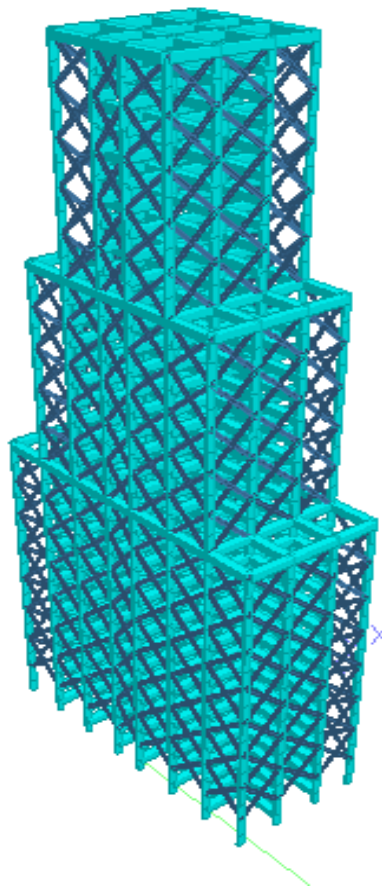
Geometric vertical irregular G+35 Building with Bracing system elevation
